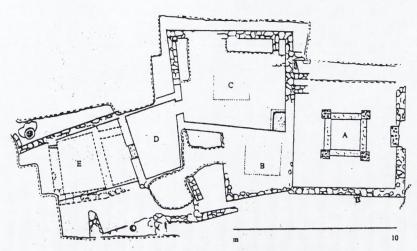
Floor Plan of the Roman Villa (Sicyonian Gate)
